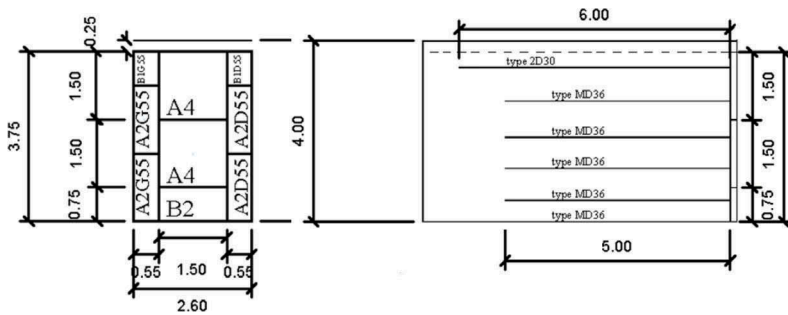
Front view of the test wall (a) showing the concrete facing panels and cross section (b) showing the layout of geostrips.
